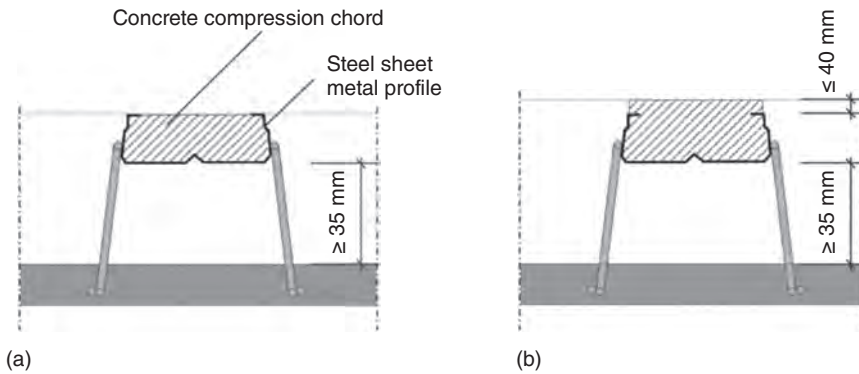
Lattice beams for floor elements that remain rigid during erection. Source: Montaquick system.
